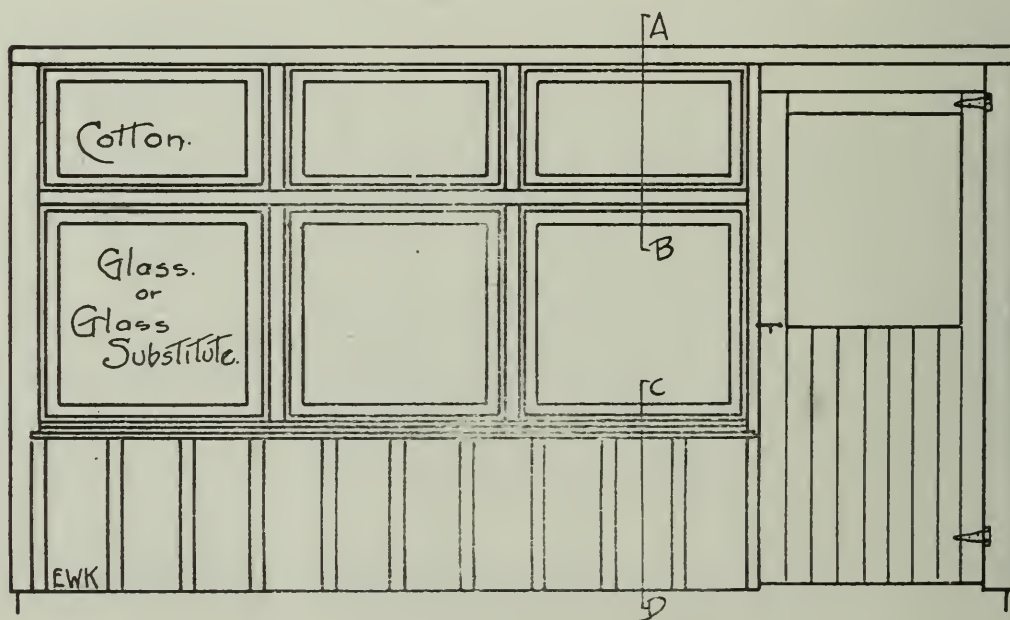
Plan of house twelve feet in depth which may be fitted with either straw or cotton loft. It may be built one pen or several pens in length, as desired.
